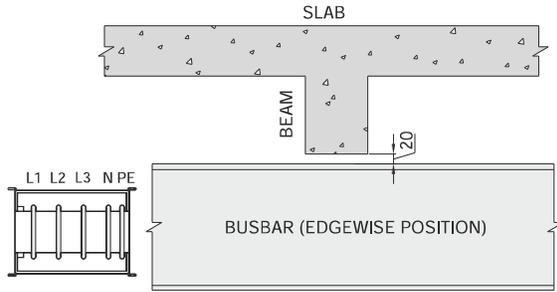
CROSSING UNDER A BEAM EDGEWISE POSITION
